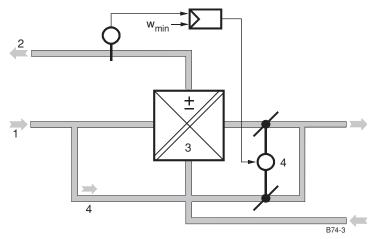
Anti icing protection control via a bypass duct for the outside air
